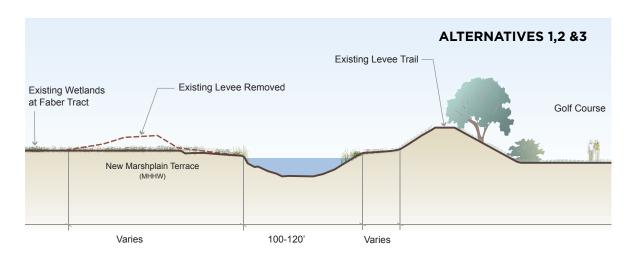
| CROSS SECTION F, VIEW LOOKING DOWNTREAM
